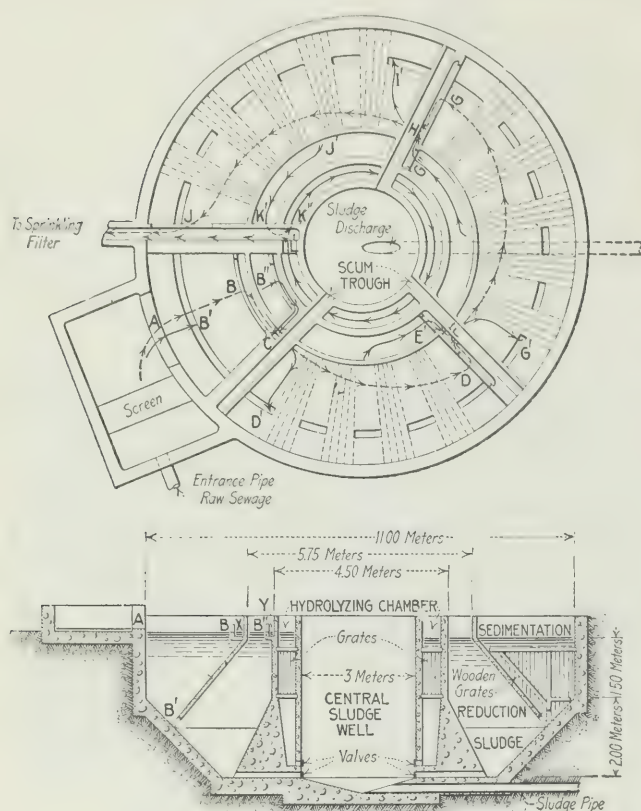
PLAN AND SECTION OF TRAVIS TANK, PAQUETA SEWAGE-WORKS
